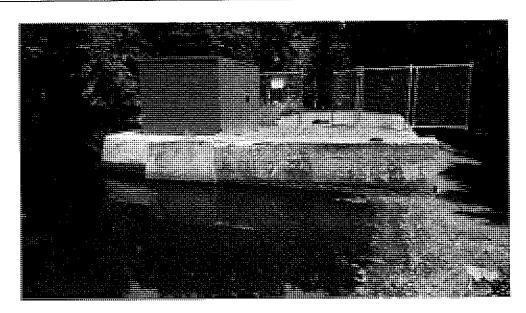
Overview of spillway, left training wall, and gatehouse from right embankment crest
